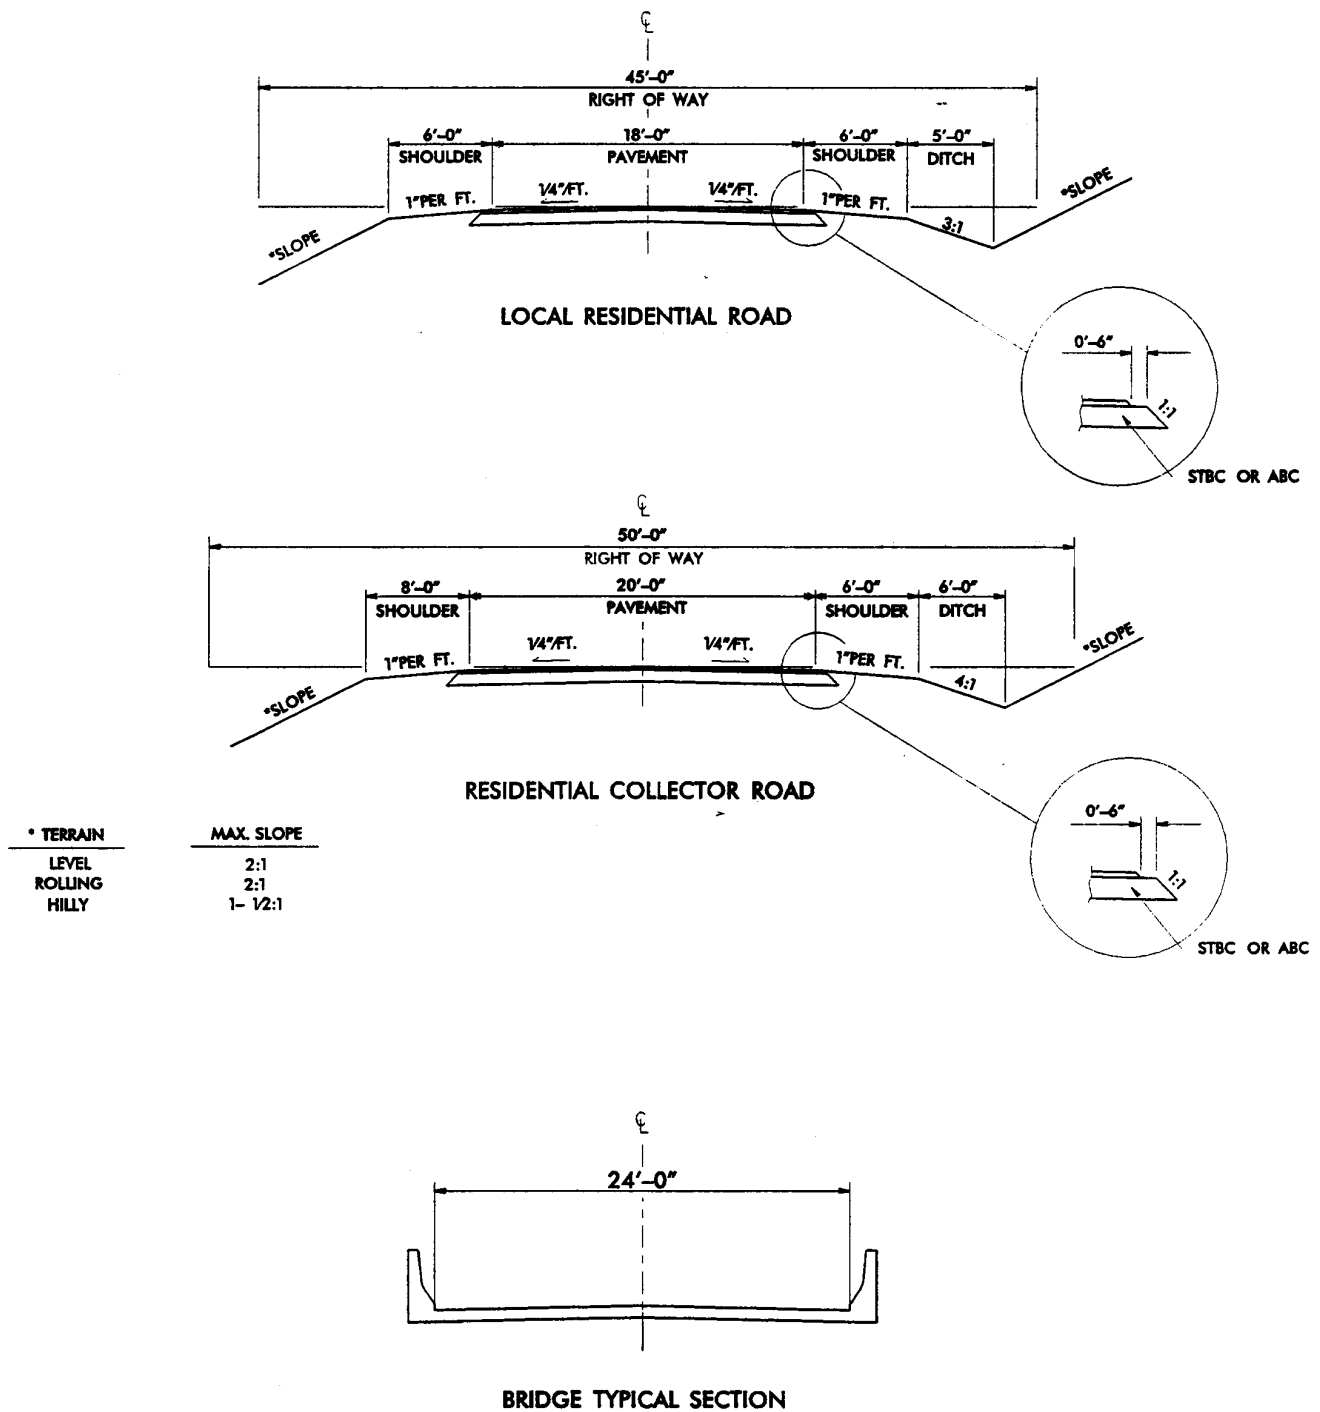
CROSS-SECTION-SHOULDER SECTION
